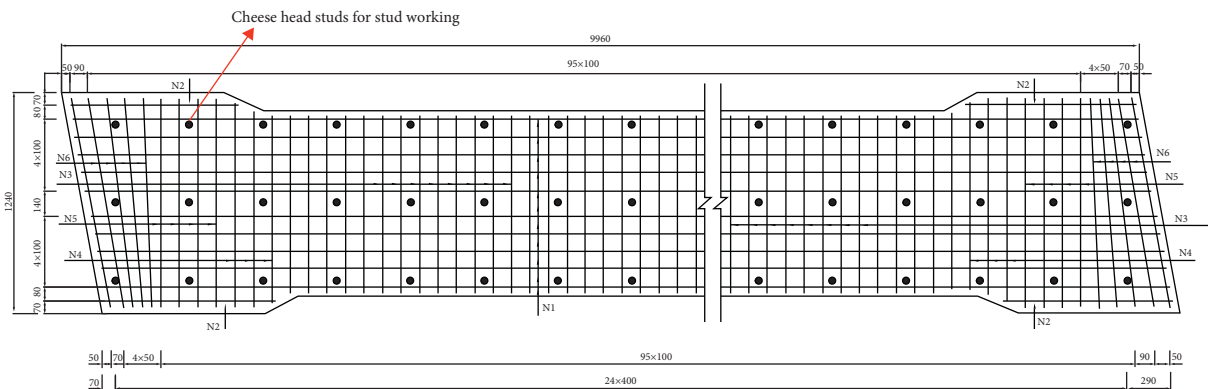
Layout of welding pin position on UHPC panel.
